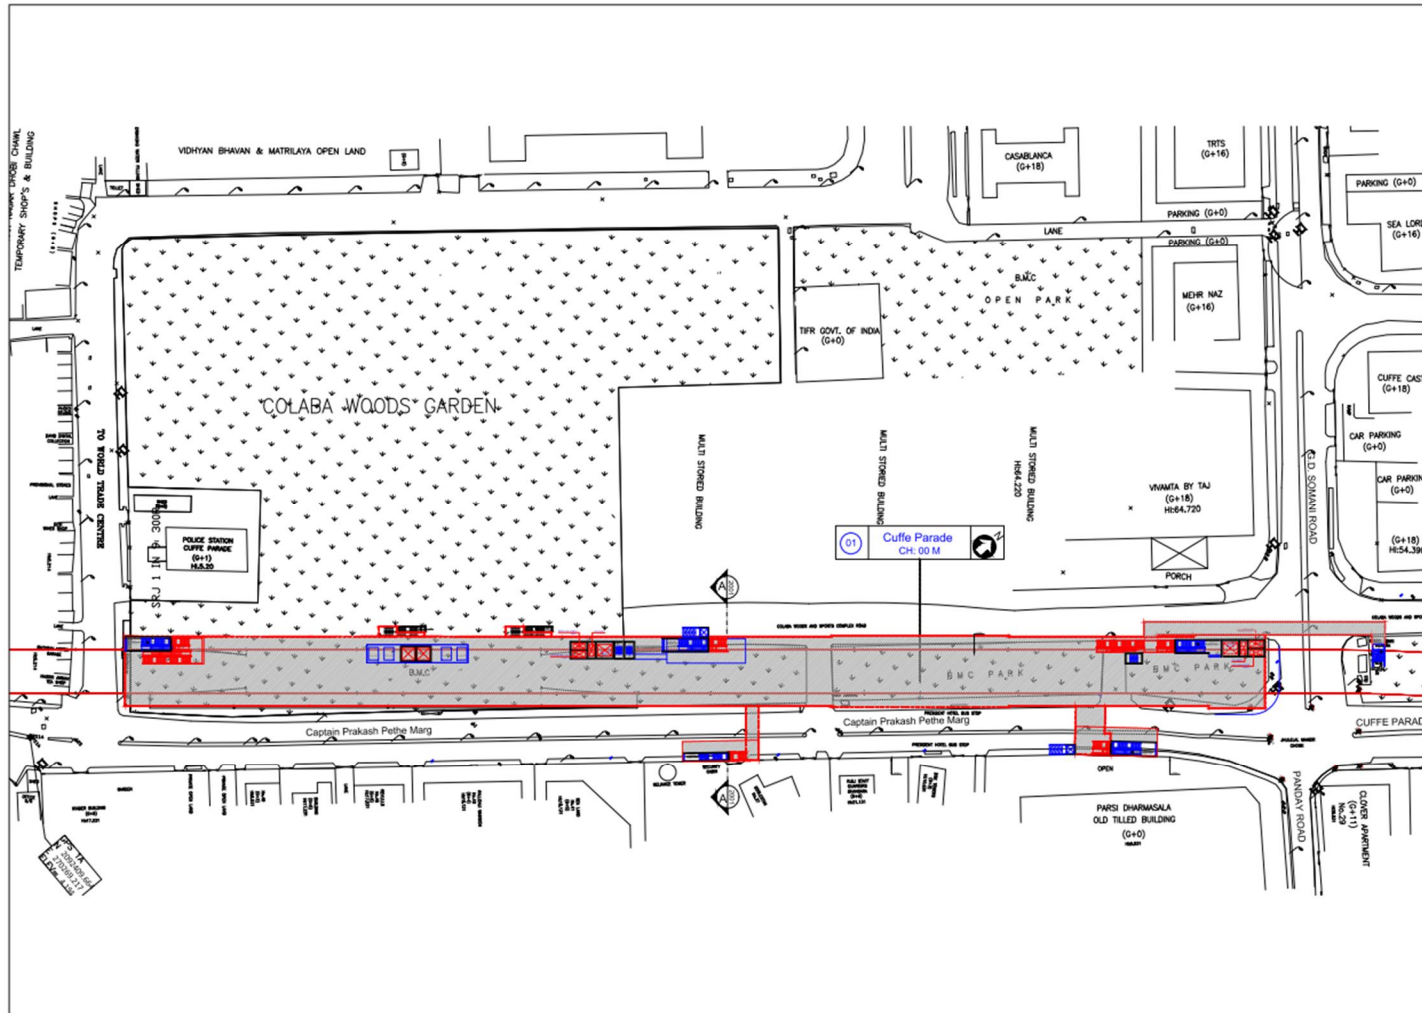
Architectural Plan of Proposed Cuffe Parade Station
